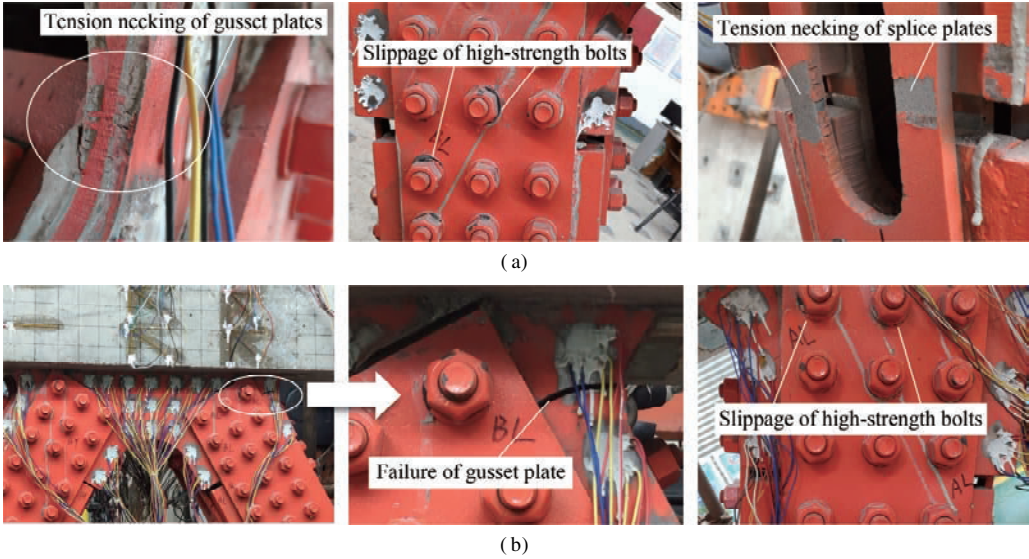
Failure modes. (a) Specimen F1; (b) Specimen F2
